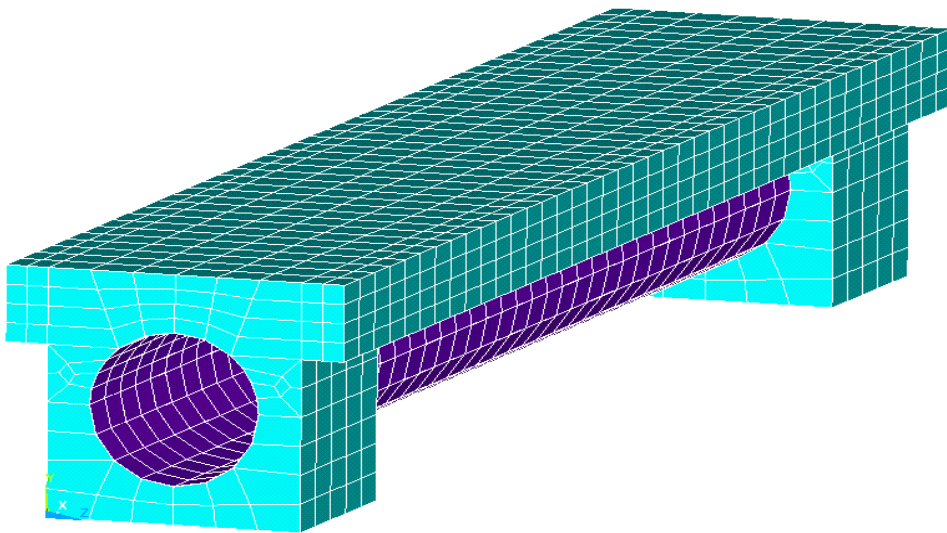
Finite element mesh of composite steel tube concrete beam specimen.
